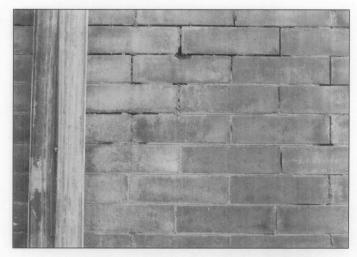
Much of the mortar on this building has been leached away by water from a leaking downspout. The downspout must be replaced and any other drainage problems repaired before repointing. Photo: Robert C. Mack, FAIA.
